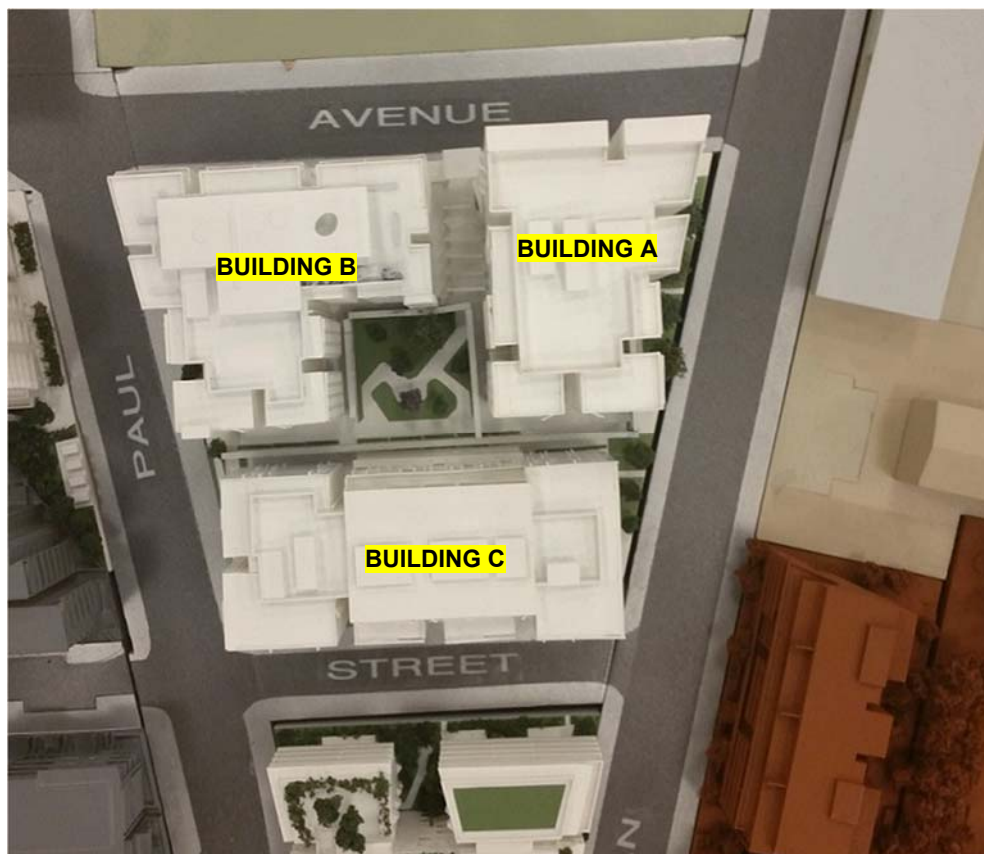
Physical model of proposed development showing surrounding streets and general building arrangement
